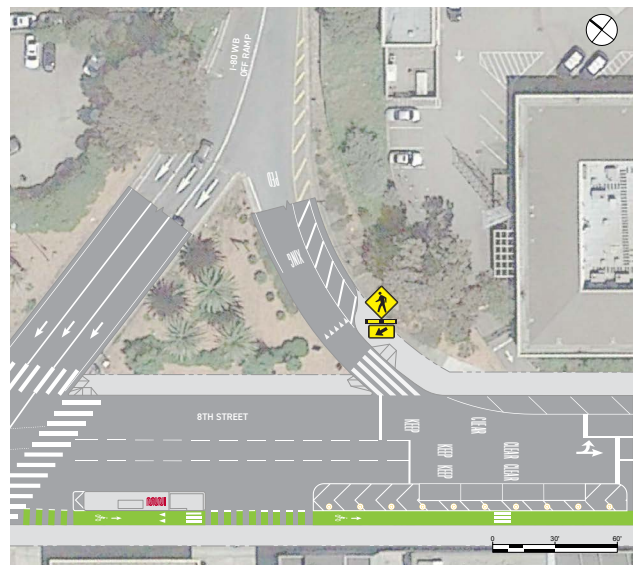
8th Street between Bryant and Harrison streets Improvement Plan
